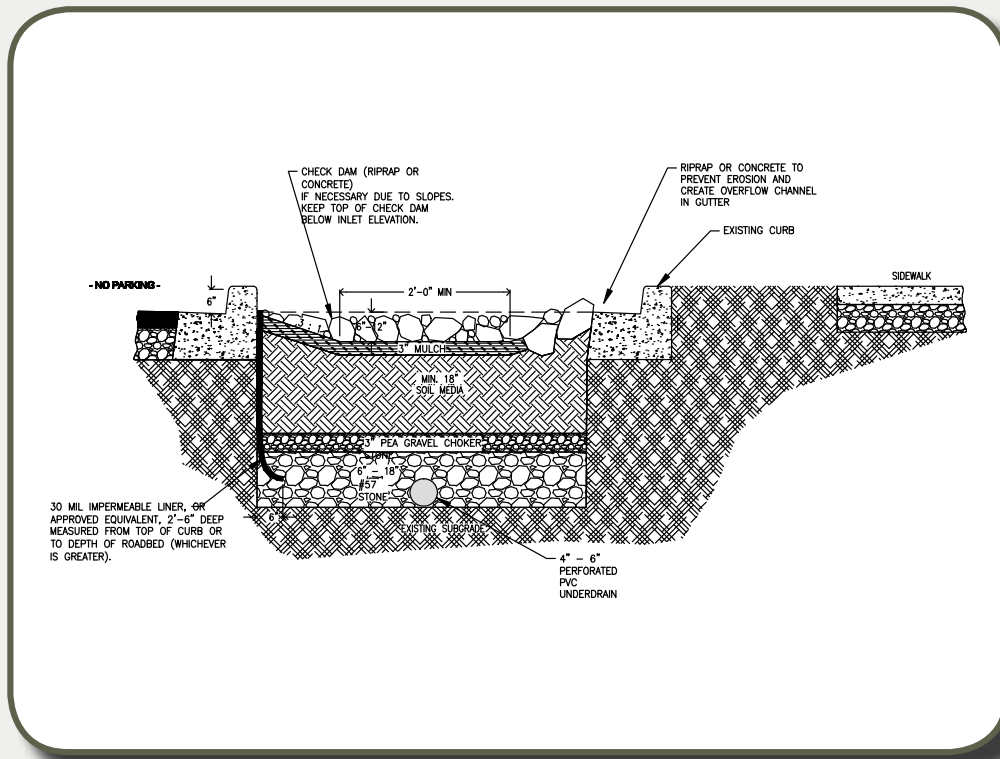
Typical cross-section for stormwater curb extension. See Figure UB-3 for location of cross-section A-A.
